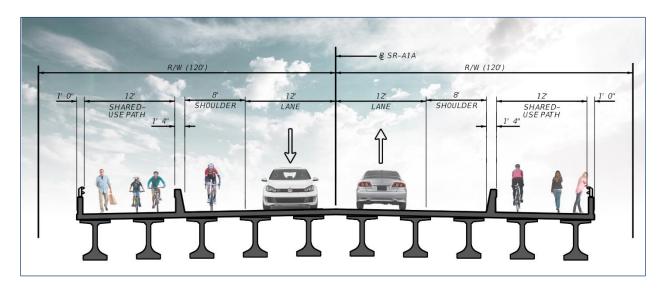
PROPOSED BRIDGE TYPICAL SECTION
